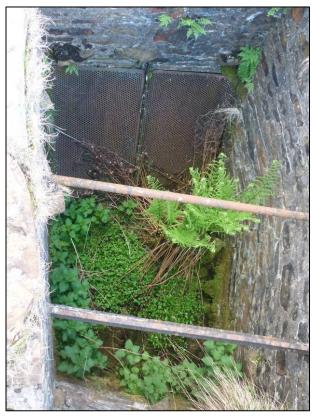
Leas House survey area, interior of 1913 collecting chamber (Site 12d) (photo 4/999).
